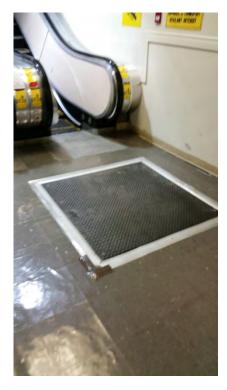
Location of sump pit on the basement floor of the mall at the bottom of the escalator.
